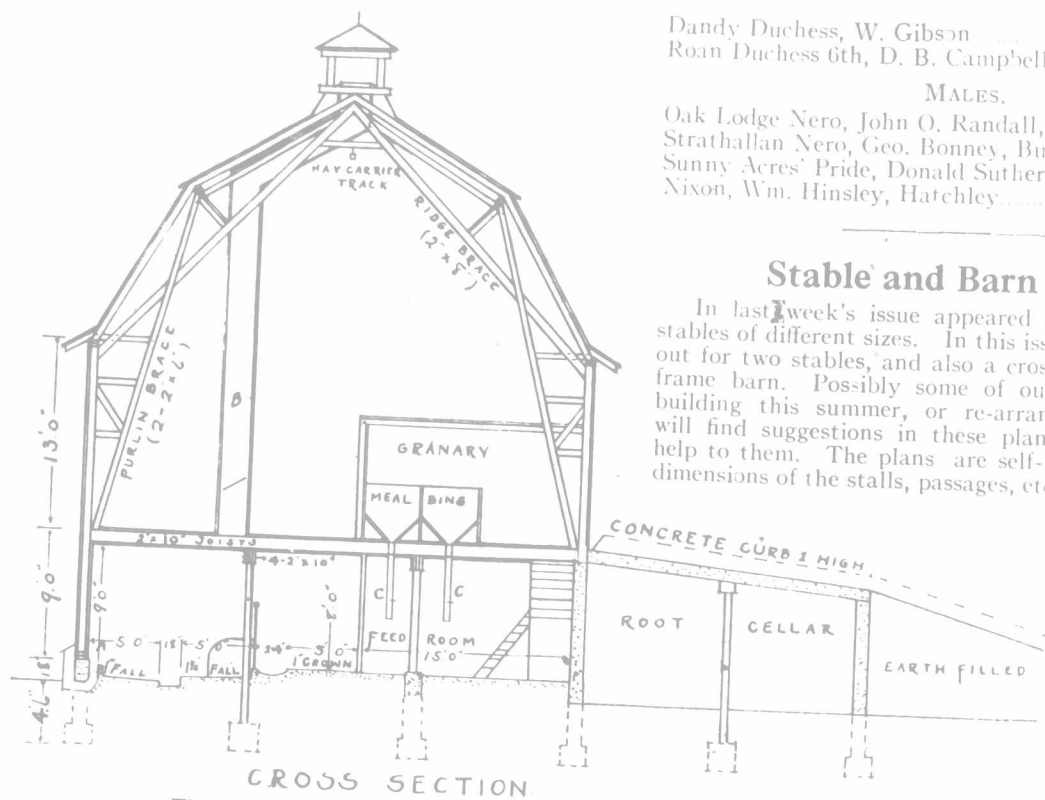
Cross Section of Plank Frame Barn and Stable.
